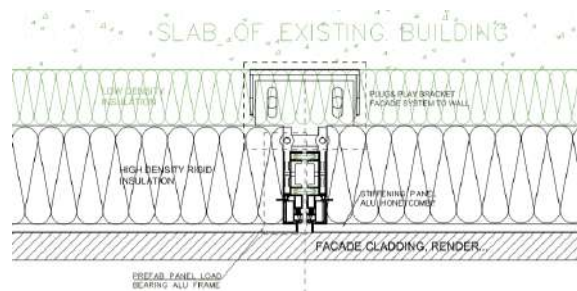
Cross-section of façade insulation element – Design Proposal (ALIVA).
